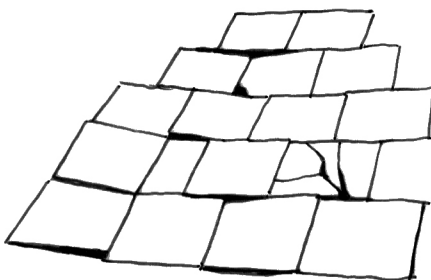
Shaking because of cracked pavement or sunken pavement
